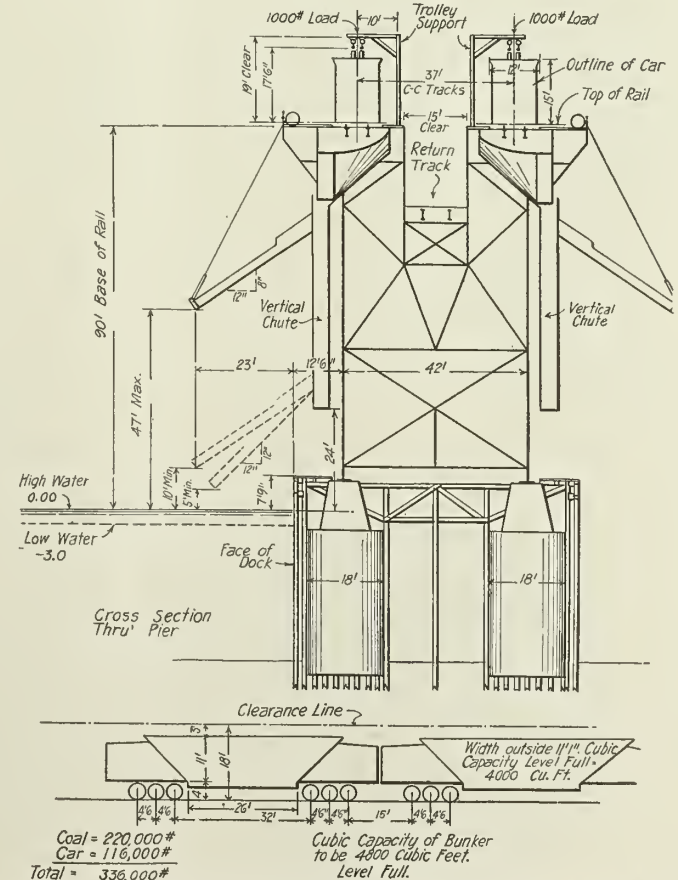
End Elevation of New Coal Pier No. 4, Norfolk & Western Ry., Lamberts Point Terminal.
